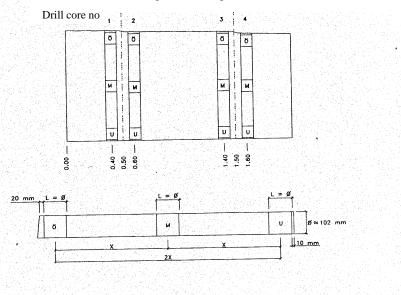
1 Splitting lines and orientation of drilled out cores from casting in formwork type 1
